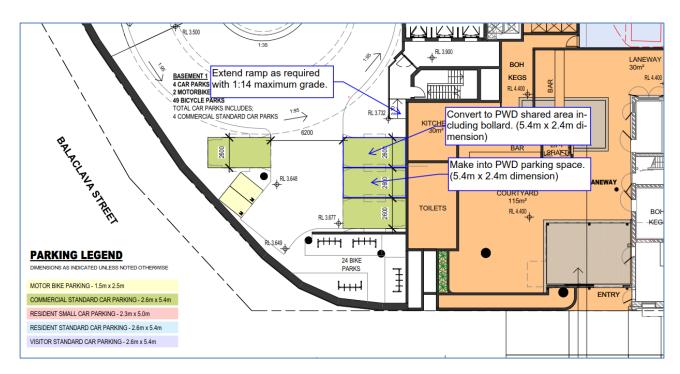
Colliers Proposed PWD Parking Space location – Basement 01
